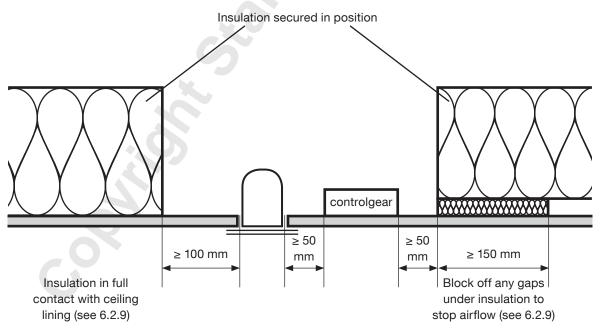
Example of ceiling insulation installed with clearance around a light fitting mounted to the top of a ceiling joist
